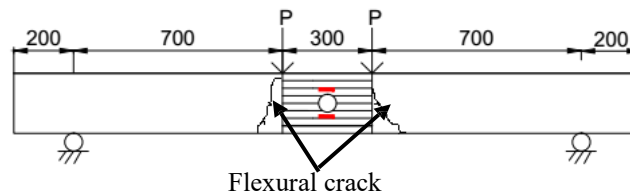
Crack pattern of Beam 5 (unit in mm).
